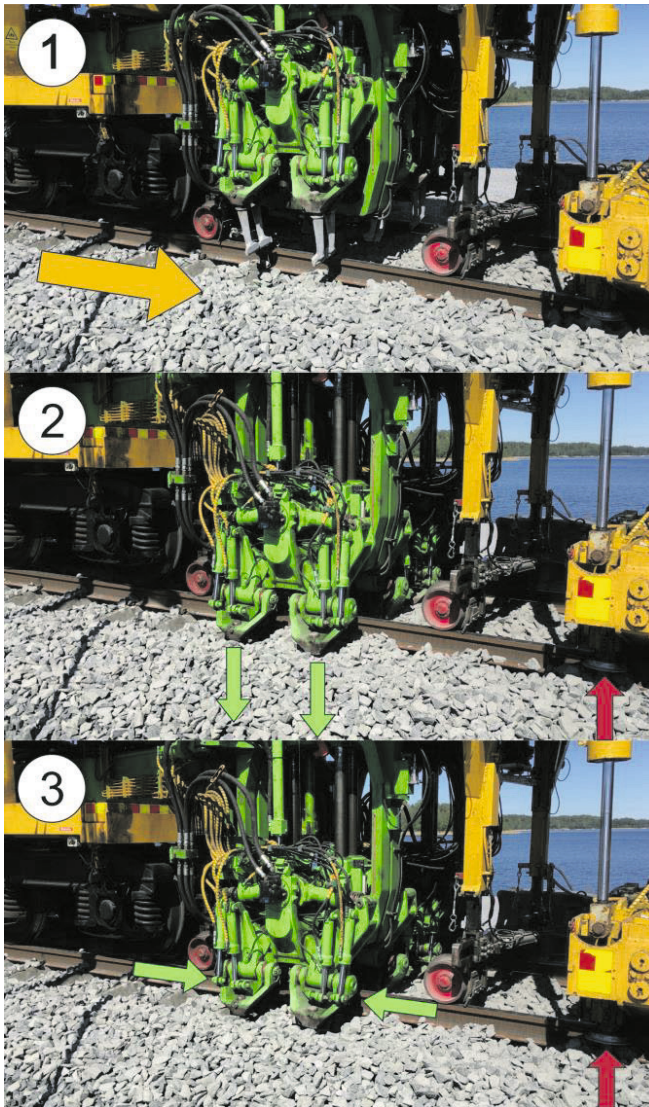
Tamping machine working principle. Photo credit: Mikko Sauni.
